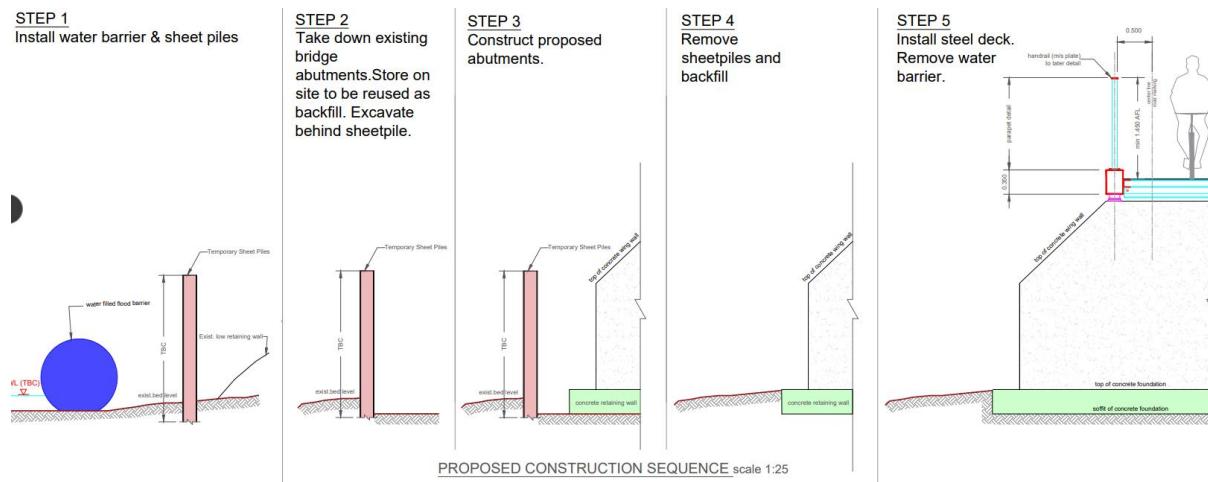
Proposed construction sequence for Bridge 1 (refer to drawing RHA-XX-DR-S-SP0012)
